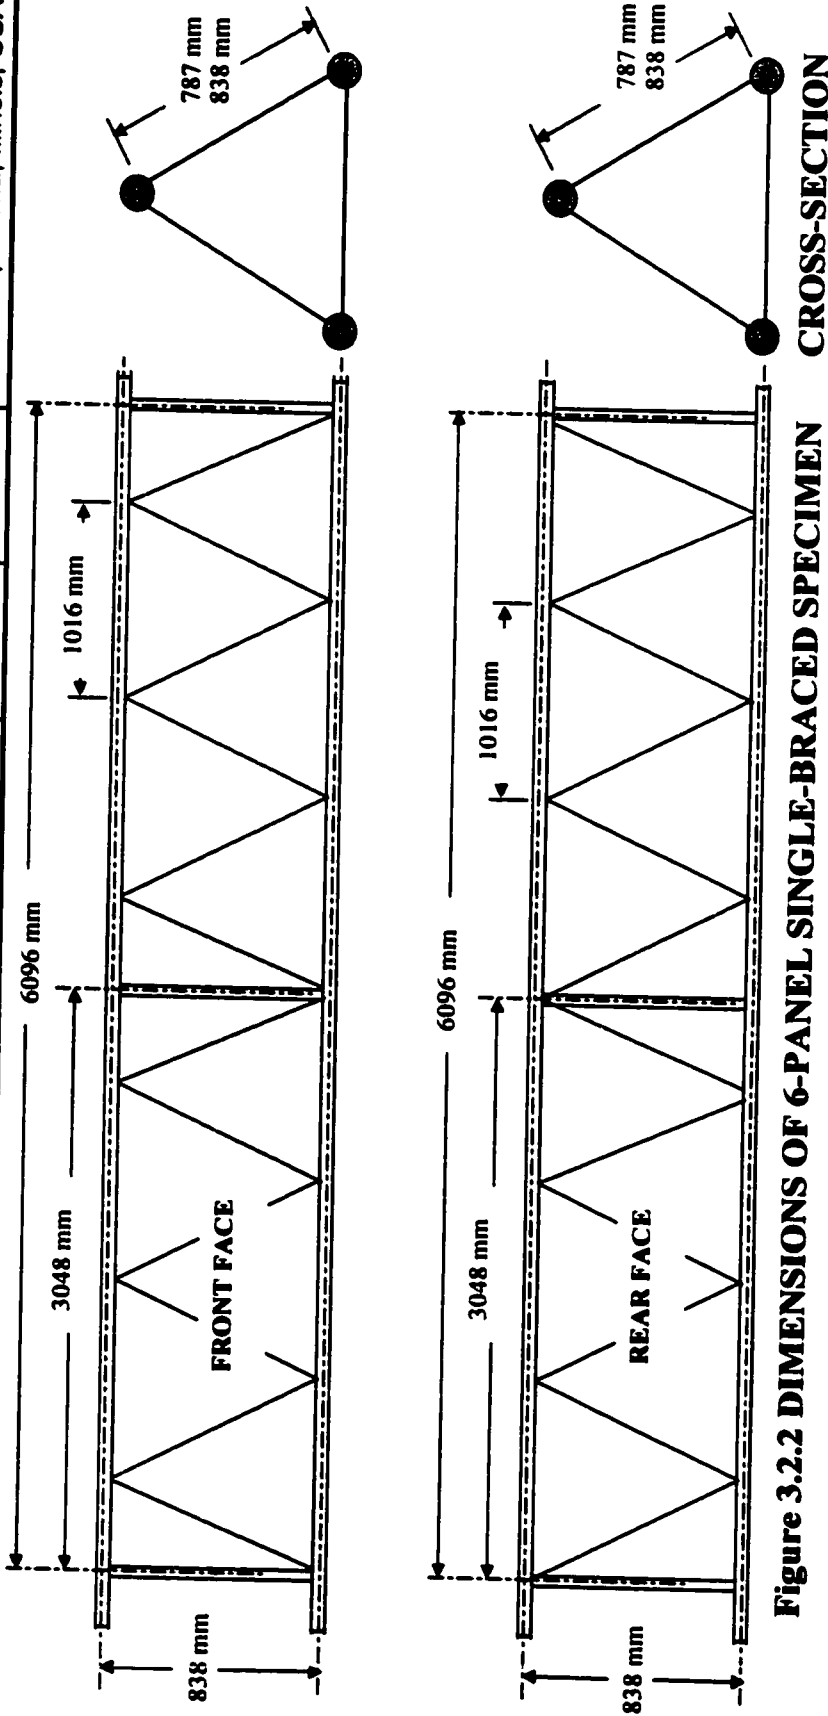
DIMENSIONS OF 6-PANEL SINGLE-BRACED SPECIMEN
